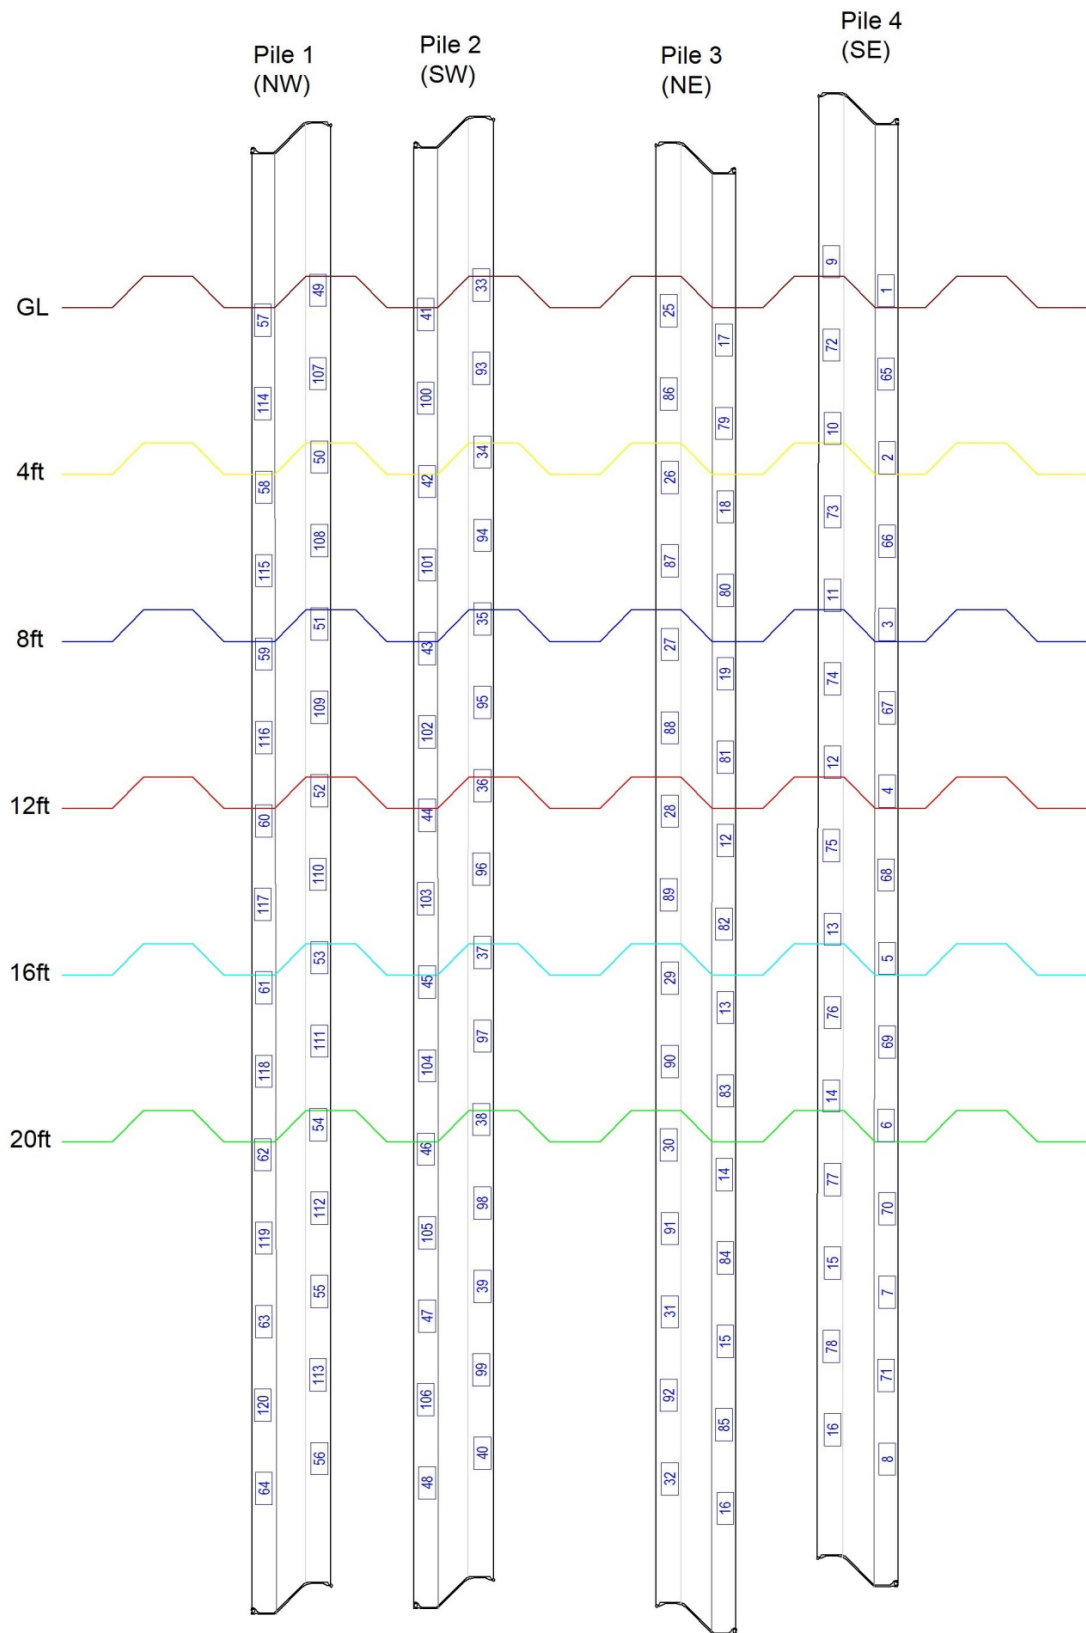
Gage diagram of pile elevations and excavation depths
